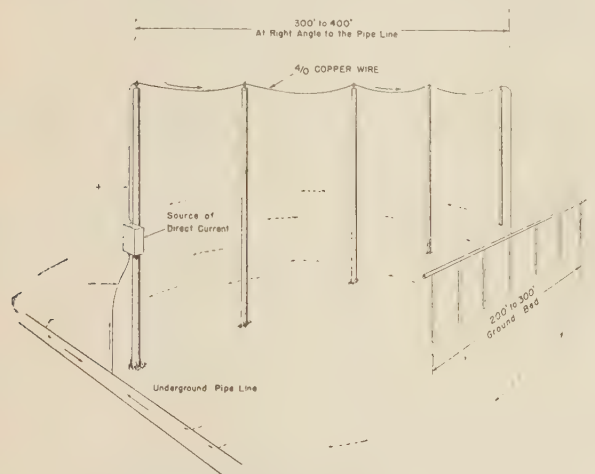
TYPICAL CATHODIC-PROTECTION INSTALLATION
